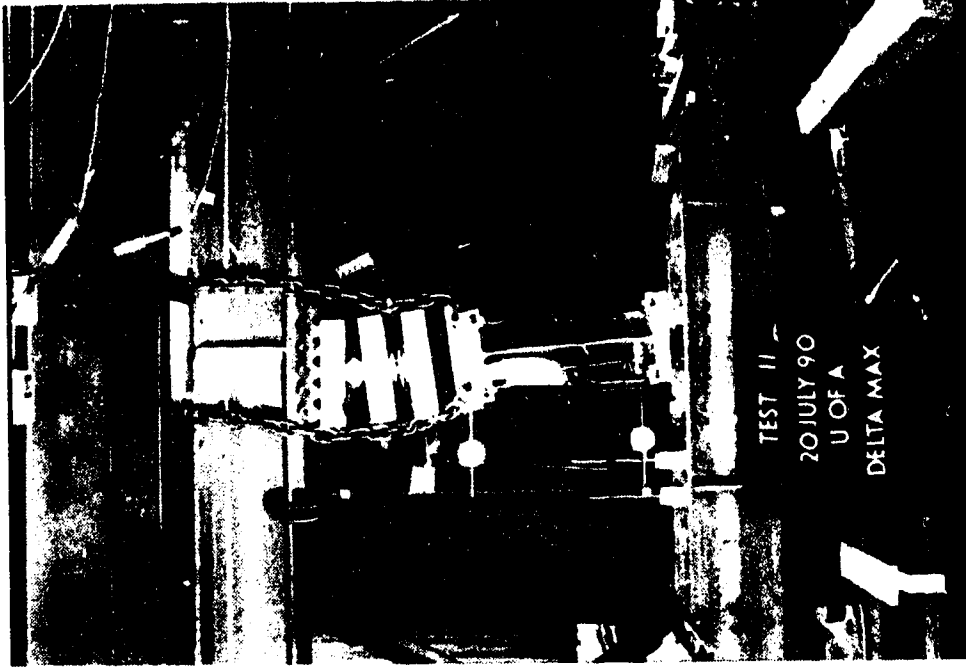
End view of distorted cross section at the cantilever tip, test 11
